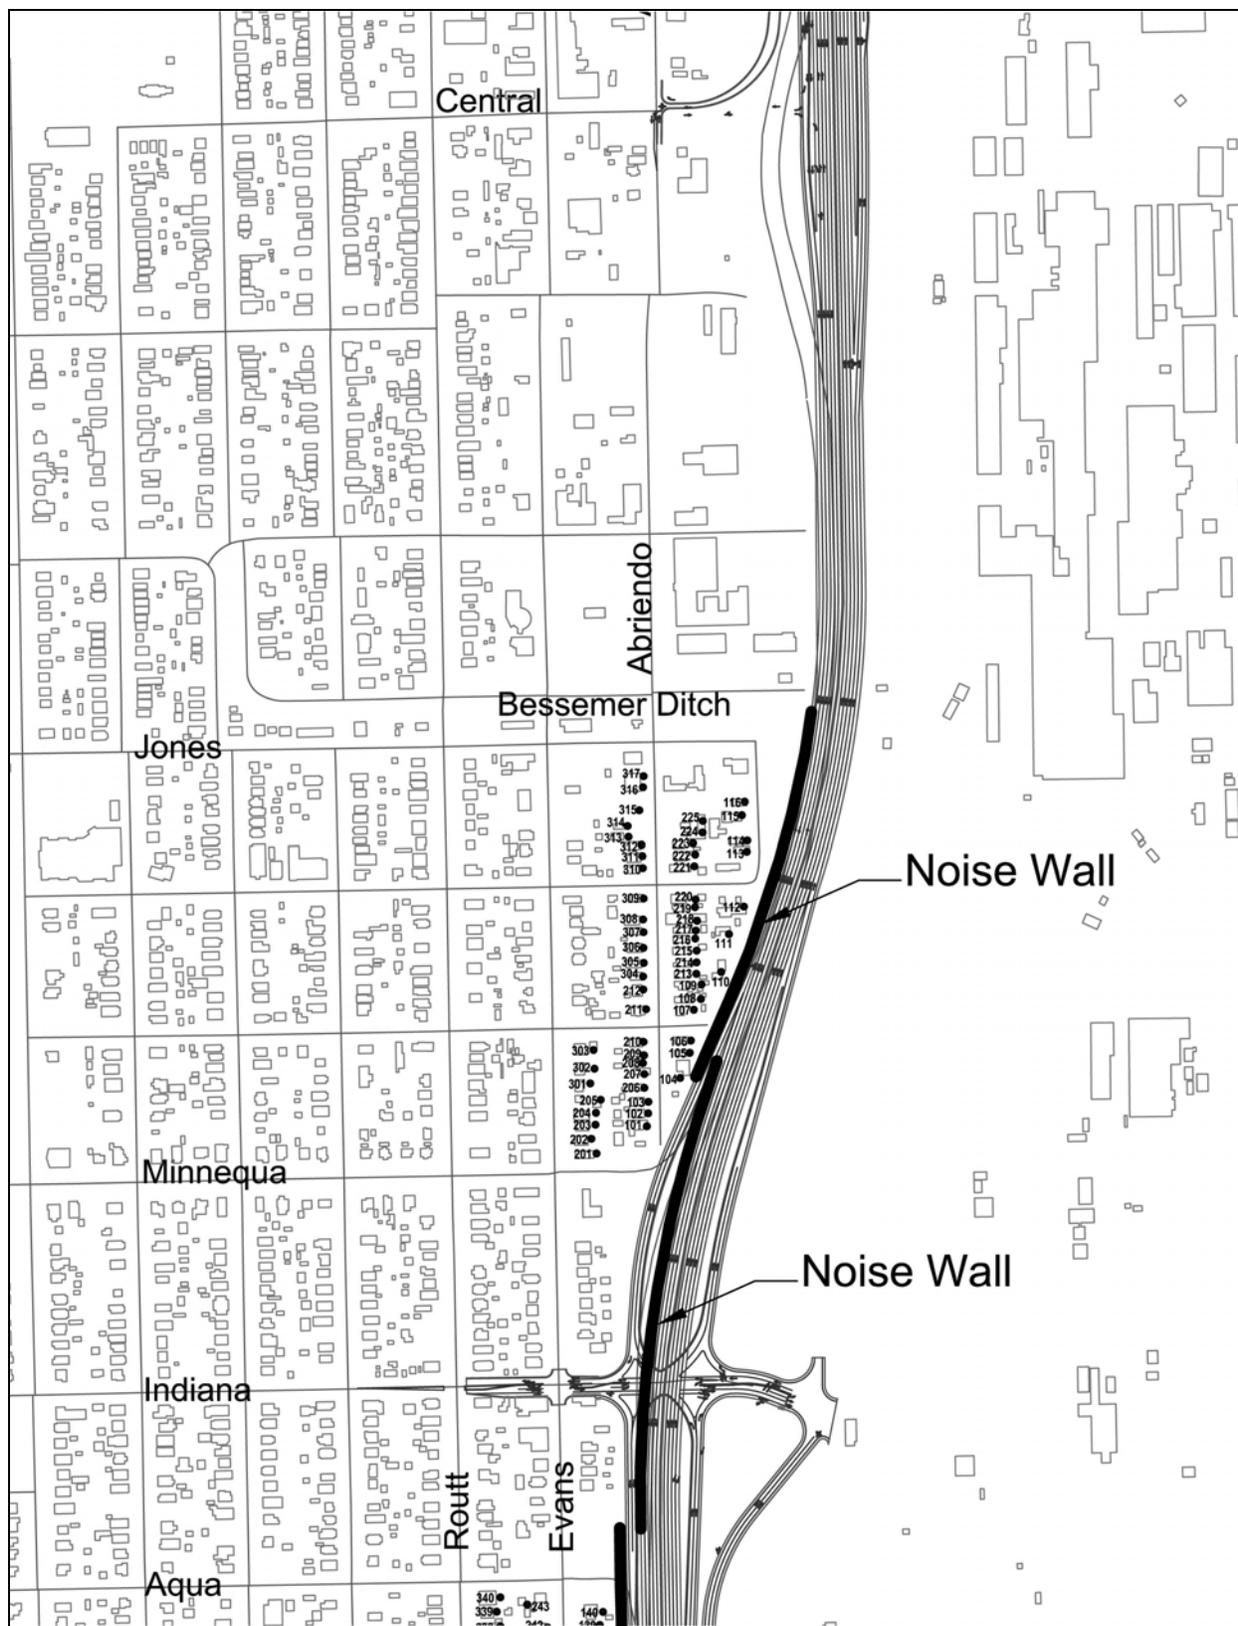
Existing I-25 Alignment Alternative – Indiana to Jones Noise Wall Analysis Location
